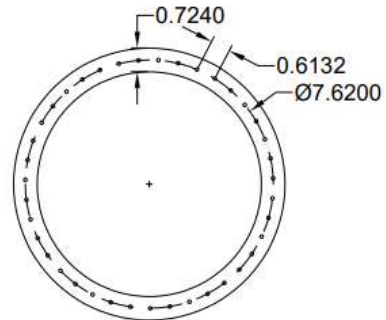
200 m cross section at 100 m, 39 ducts.
